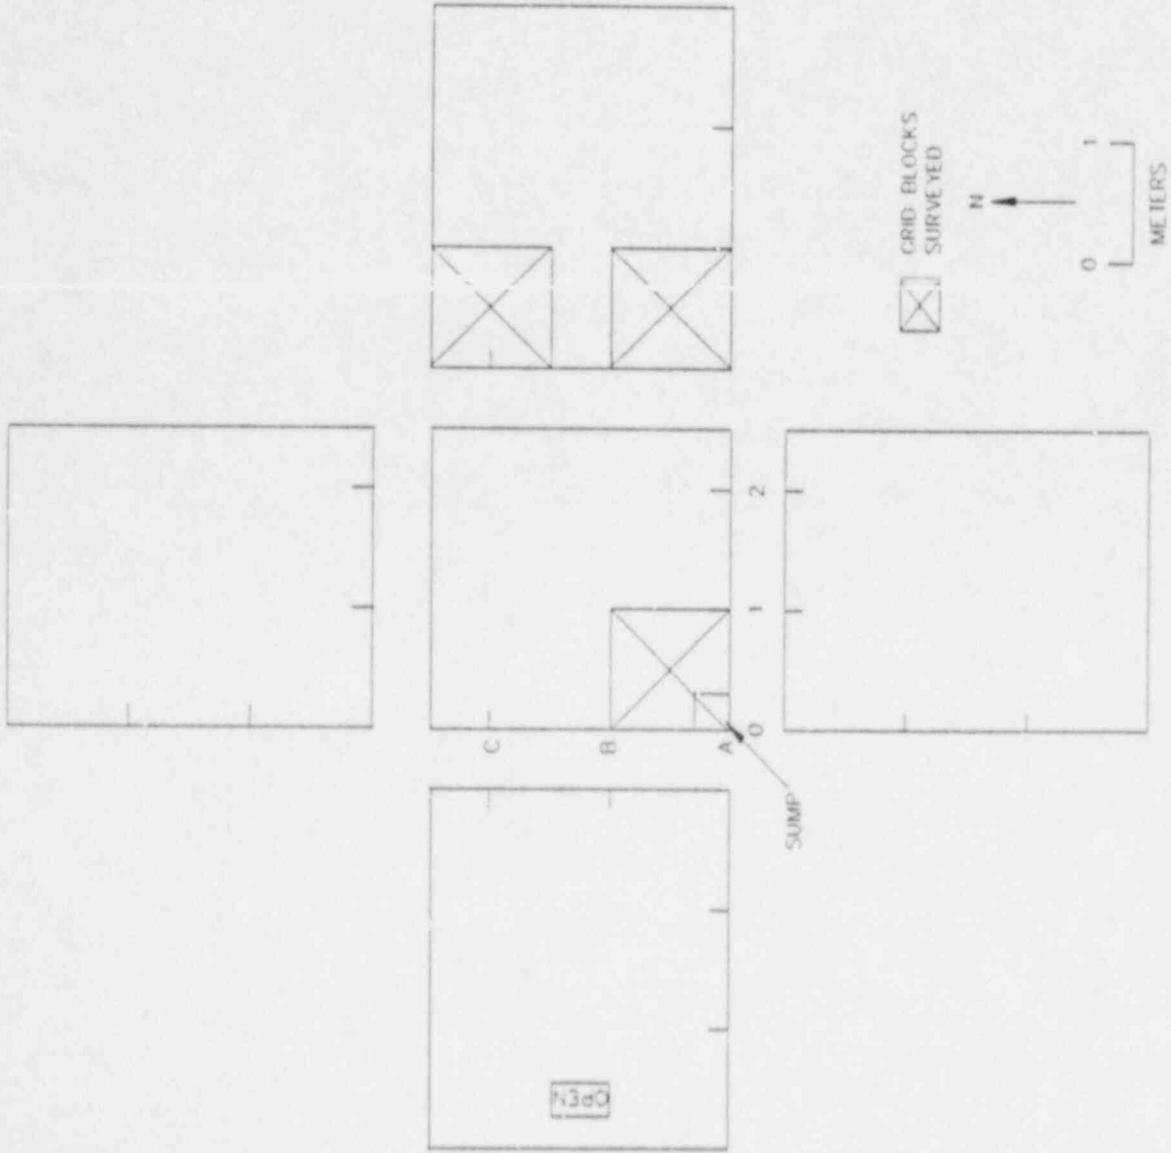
Room 19 Showing Locations of 5-point Grid Blocks Surveyed (East Waste/Sump Tank)
